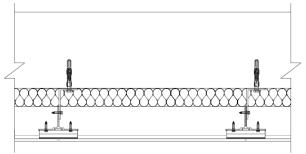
Tempio[®] FK kit with discontinuous rails. Horizontal section.
